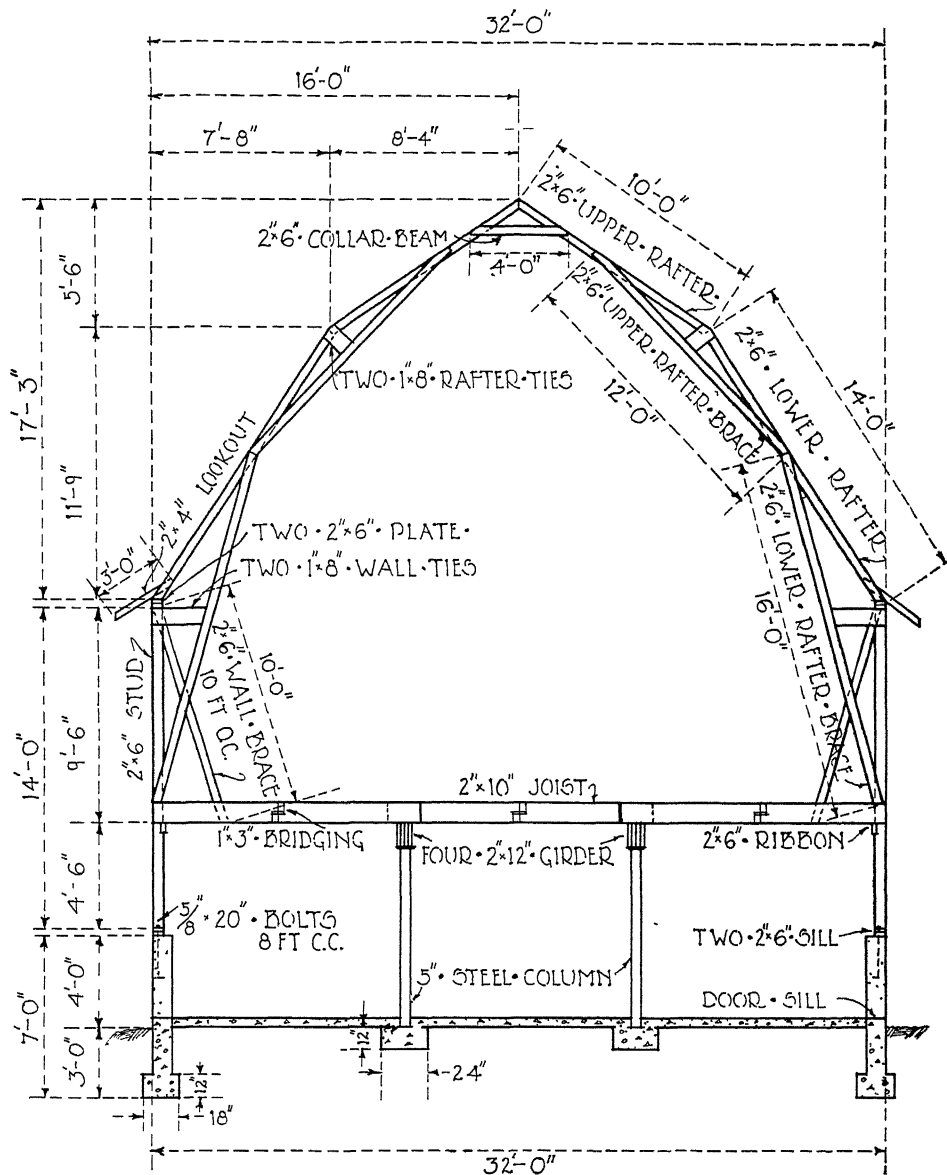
Cross section of a 32-foot braced rafter barn. Only framing details are shown. All rafters, rafter braces, ties, lookouts, studs, and joists, are spaced 24 inches on center. Wall braces are 10 feet on center. Lookouts same slope as upper rafters. (For wall and rafter tie details see Figs. 5 and 6. Girders shown in detail in Figs. 13 and 14)
